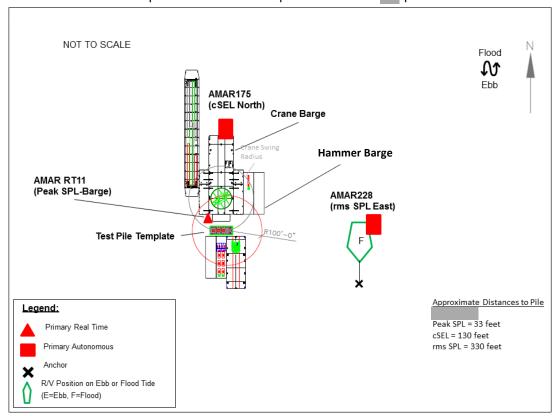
Plan View of a Typical Test Pile Barge Arrangement and Hydrophone Locations for piles
